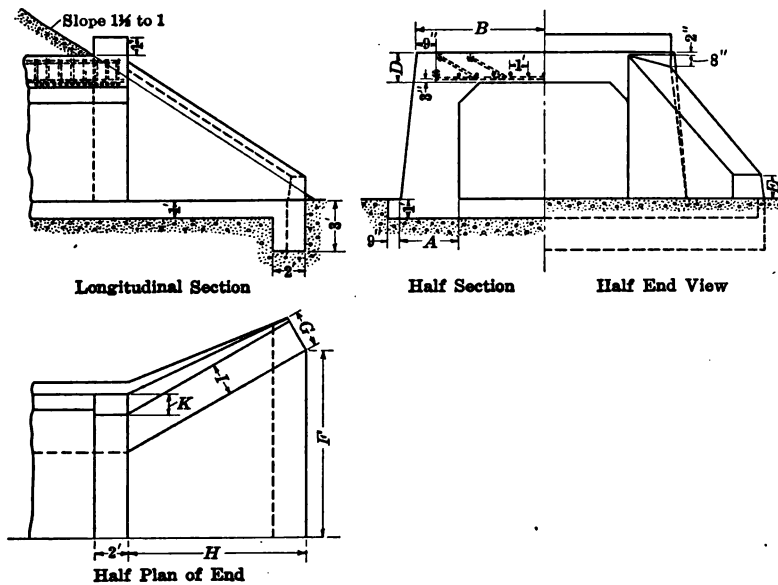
Nashville, Chattanooga and St. Louis Railroad Standard Reinforced Concrete Culverts.
